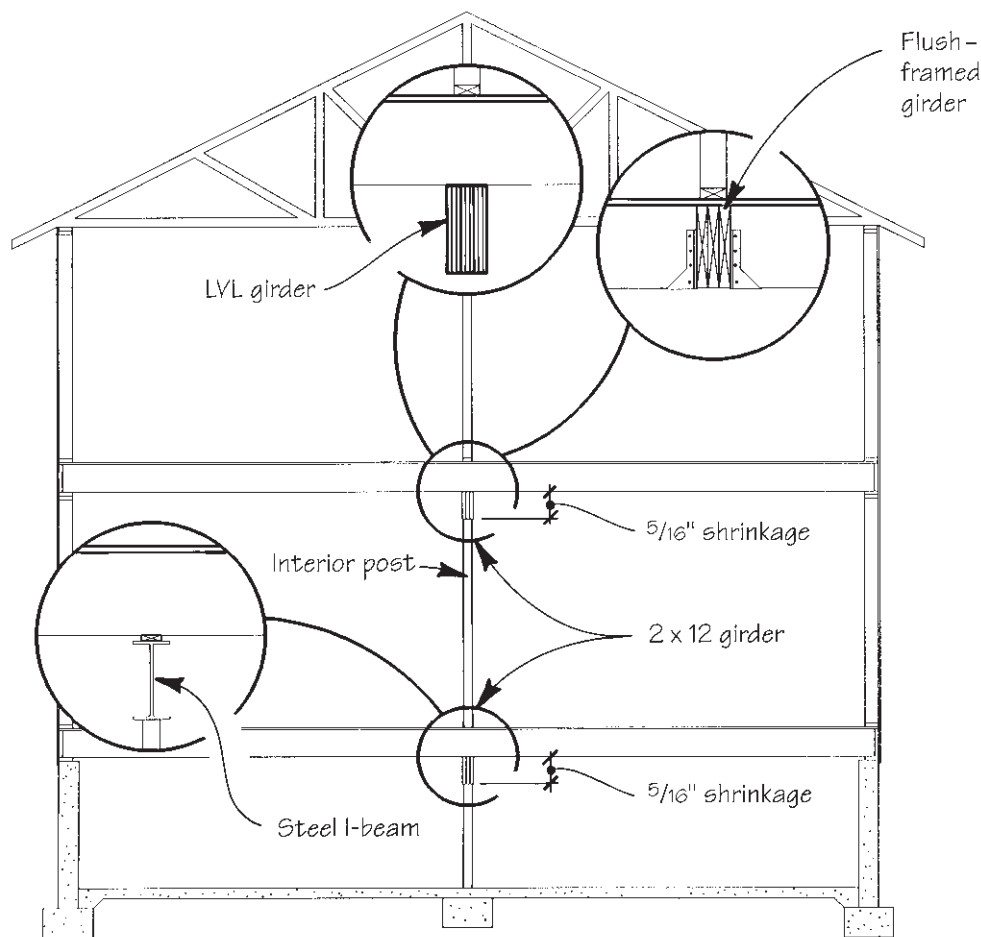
Watch out for situations where wood shrinkage can compound to create noticeable problems. In the house shown here, the two built-up 2x12 girders will cause the center bearing wall to shrink much more than the exterior walls. This will result in a 1/2-inch drop at the second floor level — enough to cause nail pops and cracks in the finishes. Using a steel I-beam in the basement and engineered lumber or flush framing at the second floor will alleviate the problem.
